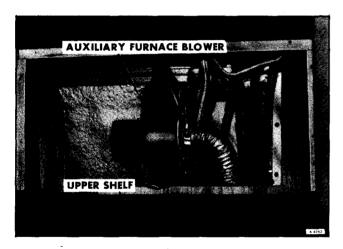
Auxiliary Furnace Blower (Located in Closet Module)
